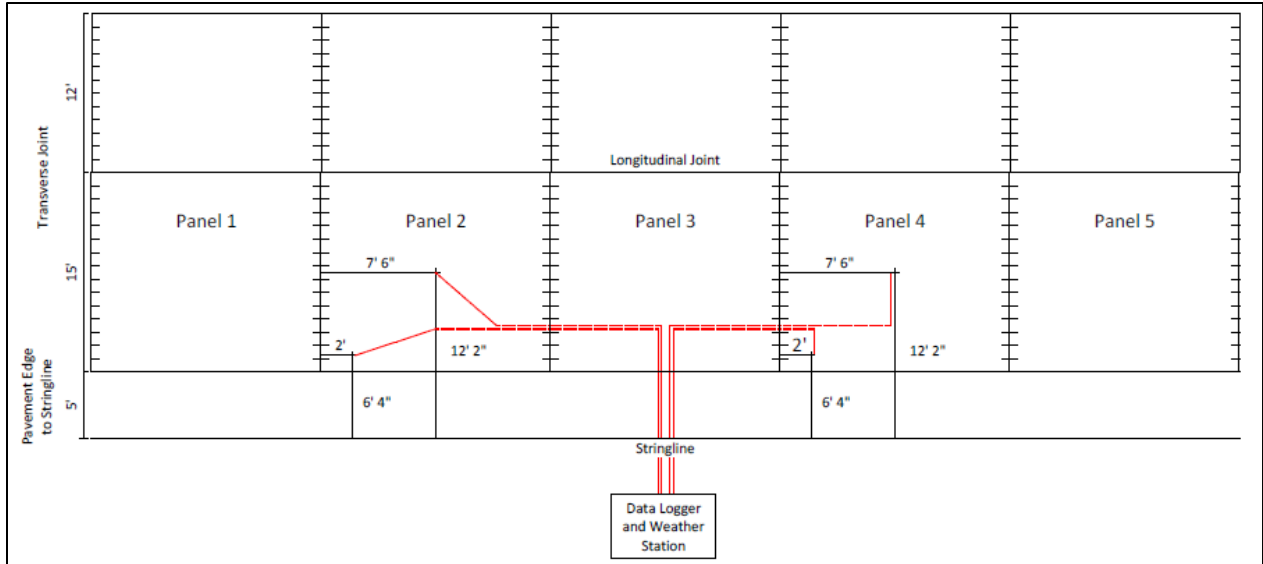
Plan View of ICC and Control Test Sections (Not to Scale)
